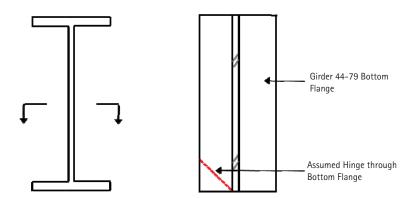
Assumed girder plastic hinging at impact (section and plan)
